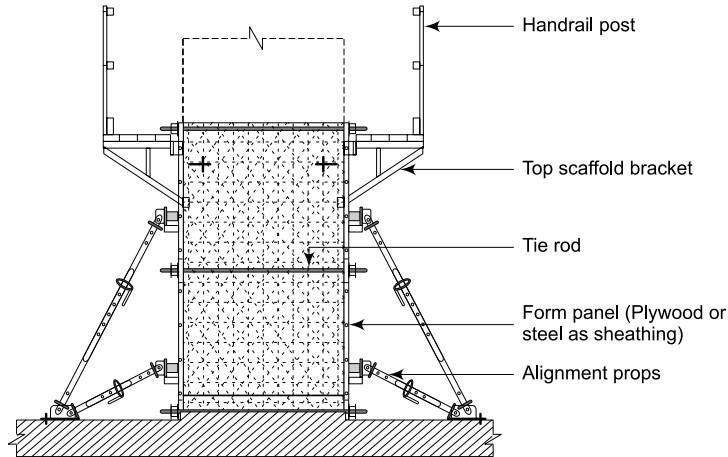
Sectional View of Formwork Arrangement for Lower Lift.
